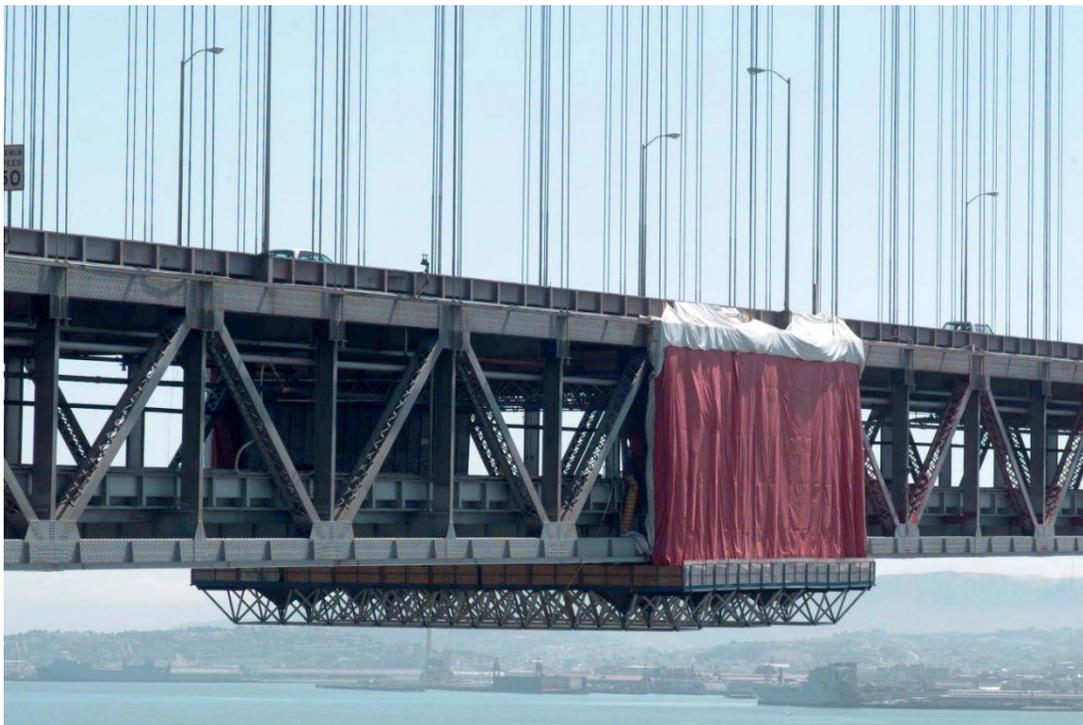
San Francisco-Oakland Bay Bridge Retrofit Included Partial Bridge Removal on a Suspension Bridge
